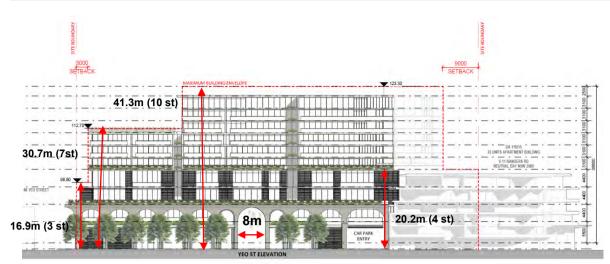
Applicant elevation plans – Yeo Street (source: Applicant's Architectural Plans, p. 20)
